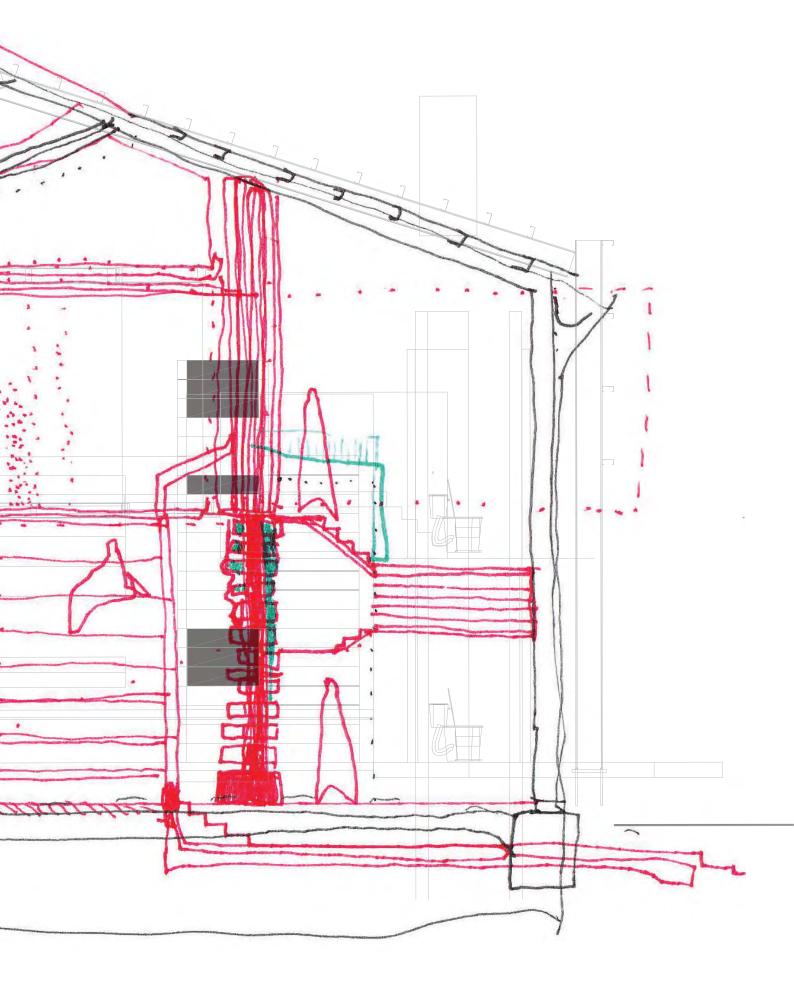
Section through the gallery and the role theatre space with tire wall construction and spolia brick.
